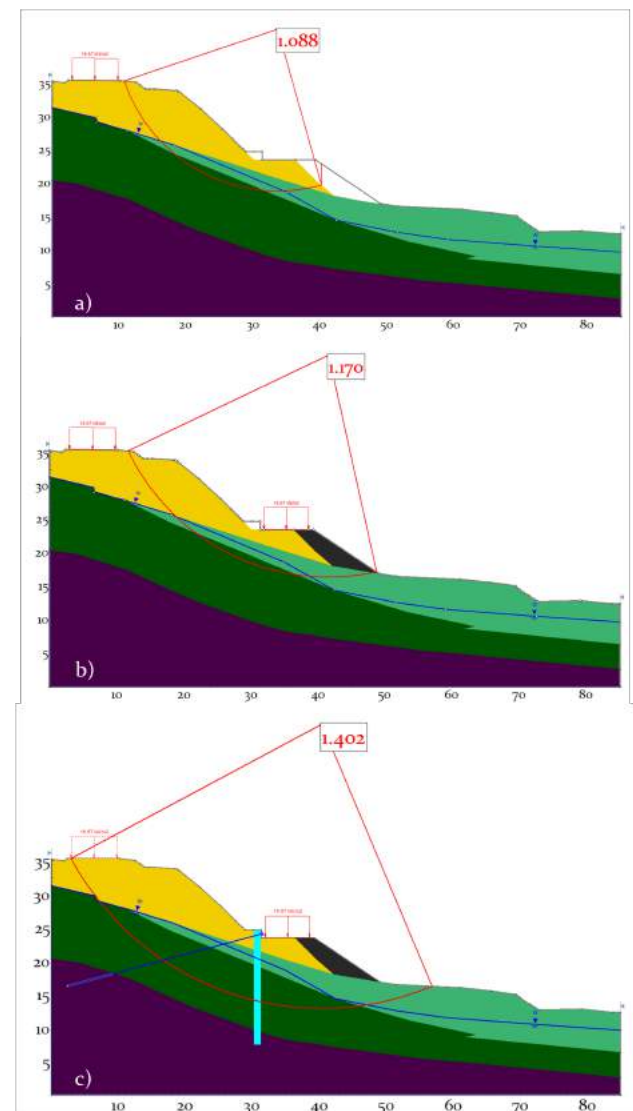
Results of slope stability analysis with factor of safety after remedial measures in phases: a) drains instalation, b) rock fill embankment construction, c) pile wall and geotechnical anchor instalation, on representative engineering geological cross section.
